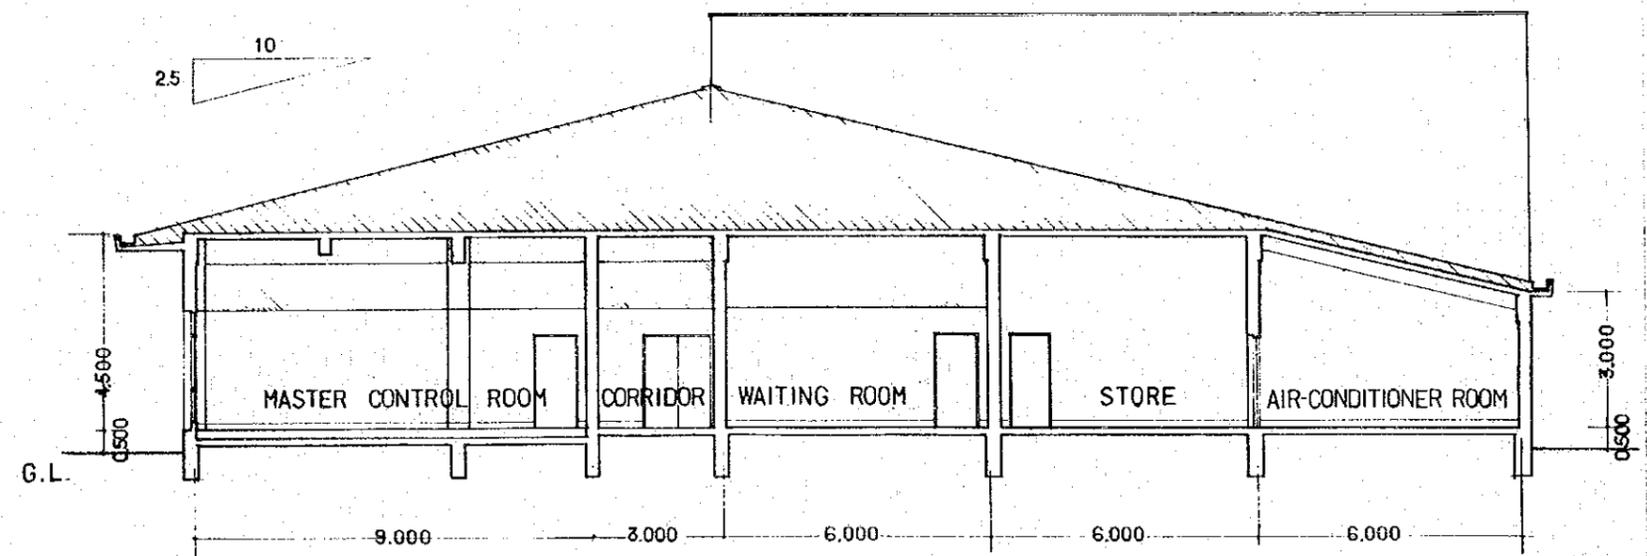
ELEVATION — POKHARA TRANSMITTING STATION
